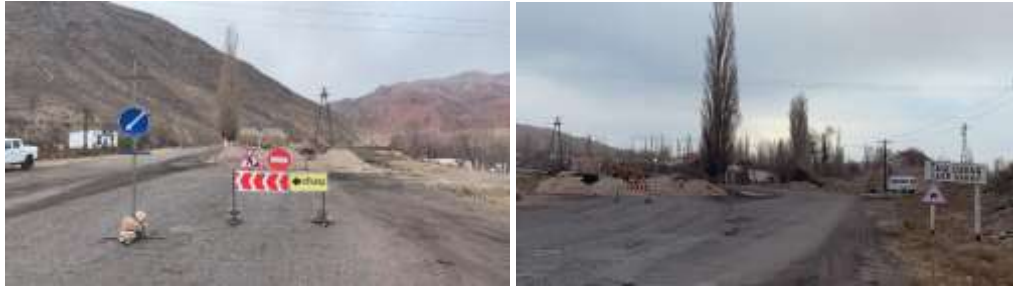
Lot 1. Road signs, detour road, animal crossing point sign on km 12+060
